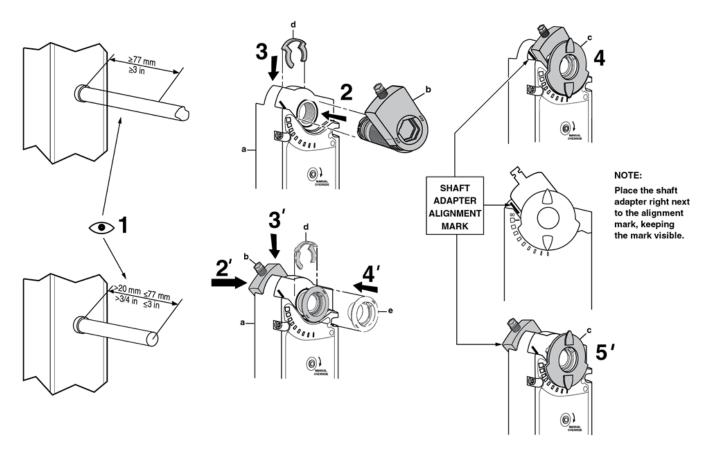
Shaft Length and Proper Shaft Adapter Location.
